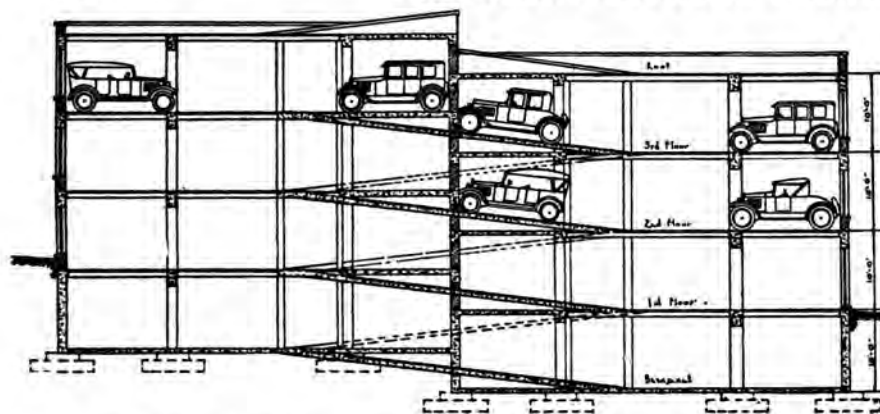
Section through Garage Showing Patent Ramp Design with Staggered Floors
